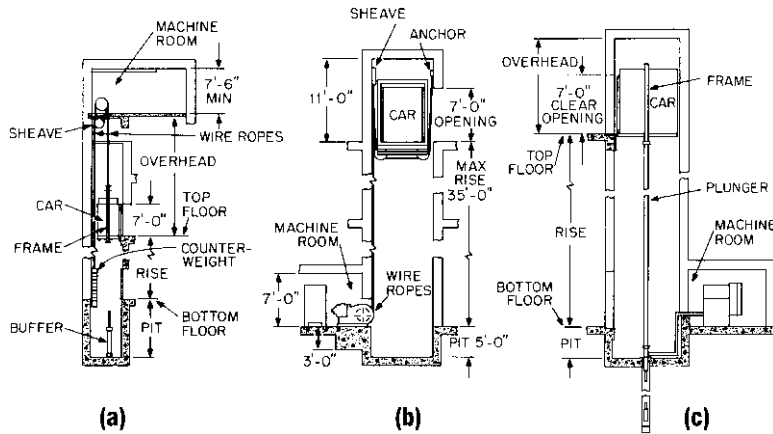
Some lifting arrangements for elevators: (a) electric elevator with driving machine at the top of the hoistway; (b) electric elevator with driving machine in the basement; (c) hydraulic elevator moved by plunger.
